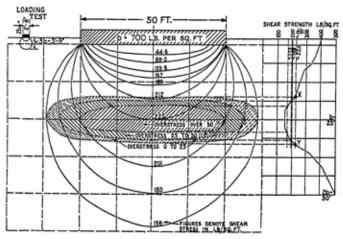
Raft Foundation. Over-stressed Zone. (Problem 80.)
